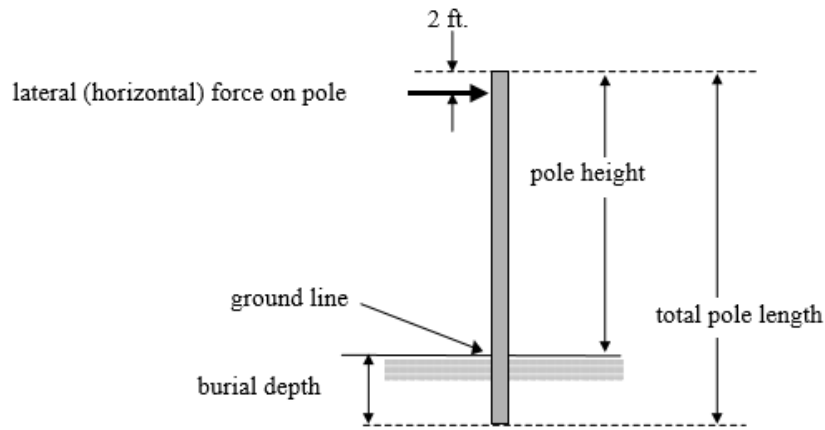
Lateral Force Applied to Installed Pole (Outside Plant Consulting Service,2002).
